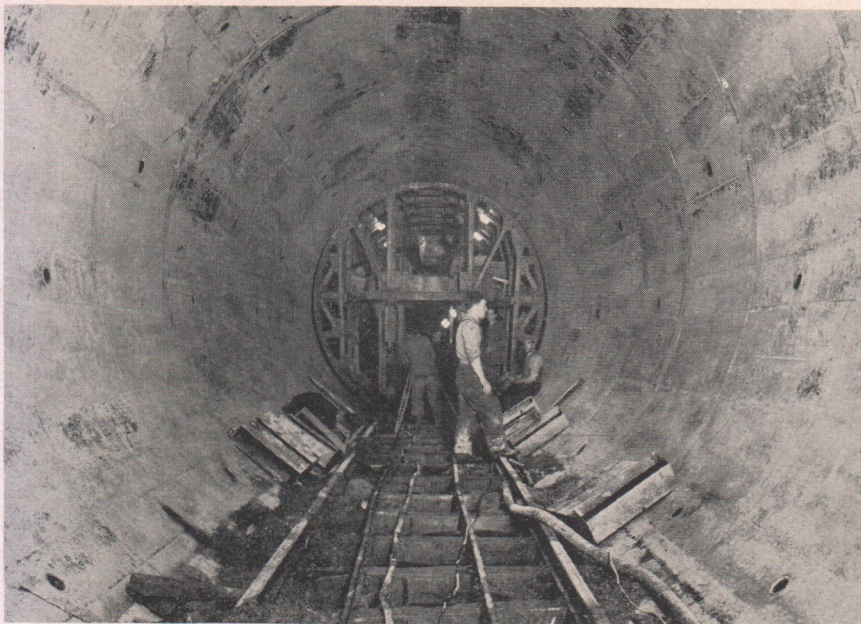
High-pressure section of Fasnakyle tunnel being lined. Note the grouting holes in the tunnel walls
